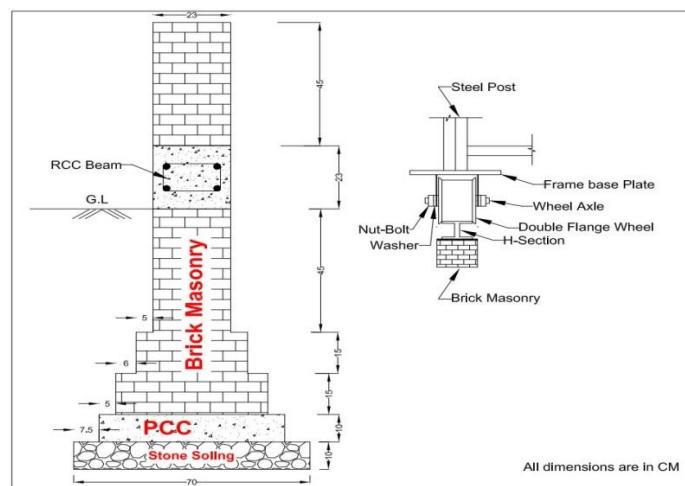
Wall section on which railway track has been fixed and x-section of rail system
